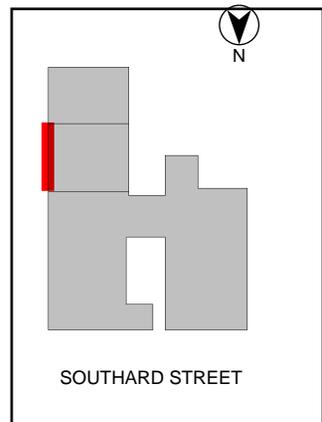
EAST WING, EAST SIDE, MIDDLE ADDITION
